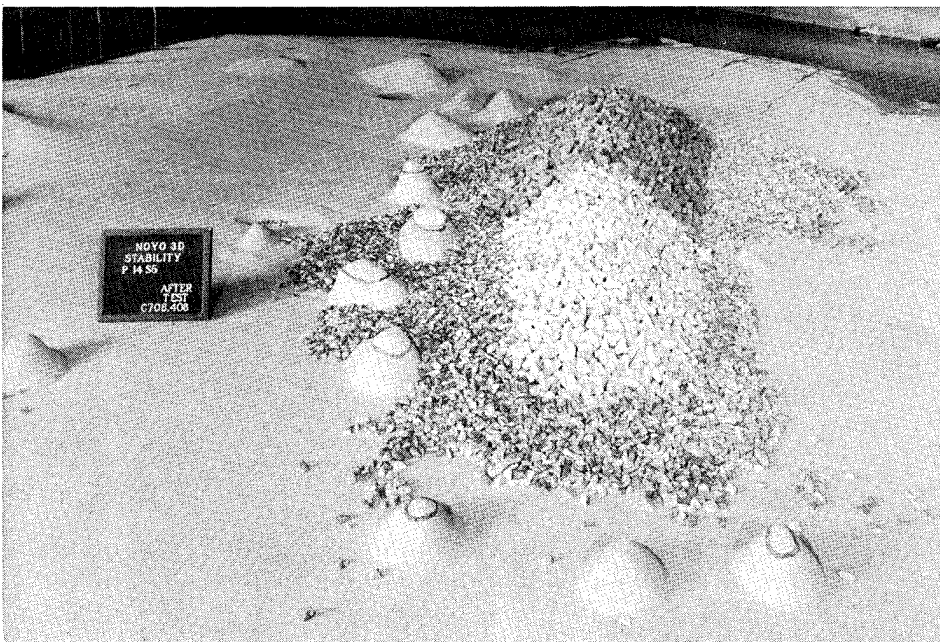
Plan 14, south roundhead after five series of Storm IB waves
